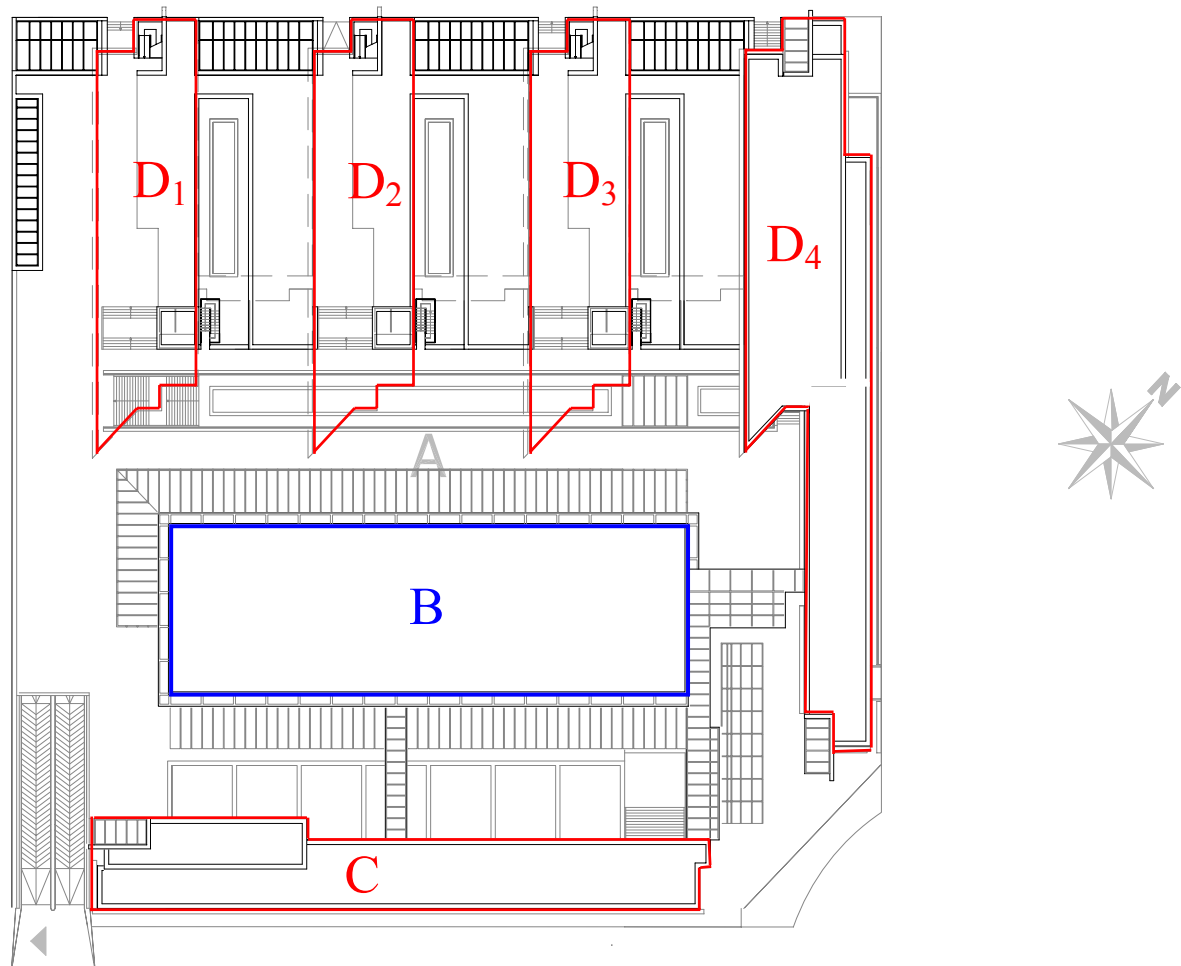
Whole complex with existing and refurbished building B, and new parts C and D₁ to D₄.
